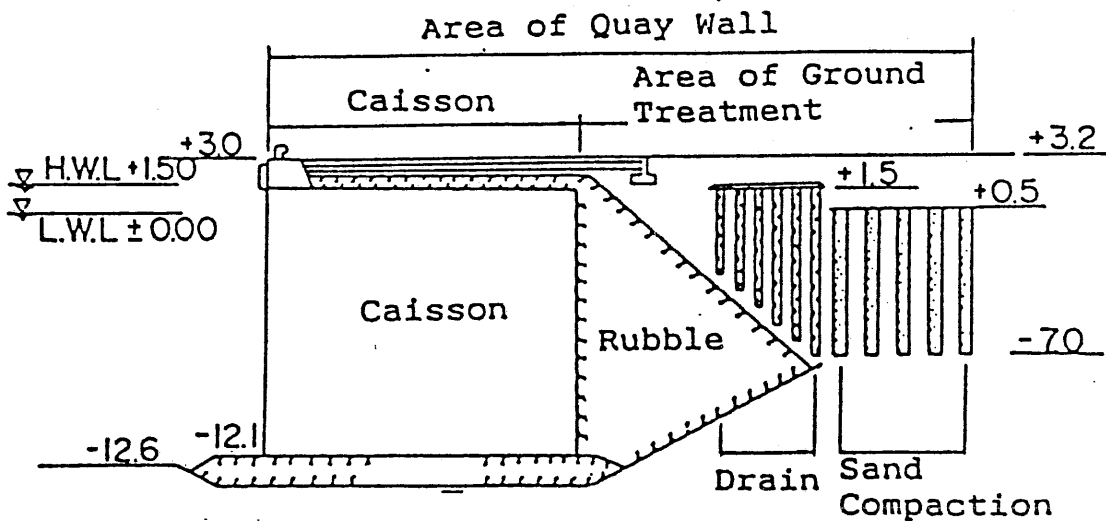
Use of Sand Drains and Sand Compaction Piles to Stabilize Backfill for Caisson Foundation. (From Iai *et al*, 1994.)
